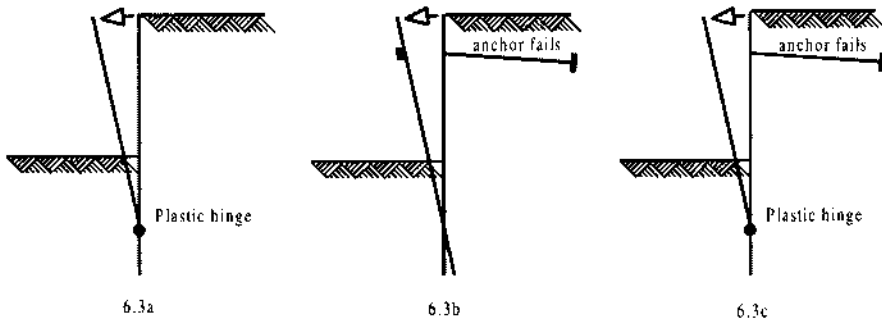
Structural failure mechanisms for walls with a fixed earth support: 6.3a, Cantilever plastic hinge, 6.3b, anchored, failure of anchor, 6.3c: anchored, combined.
